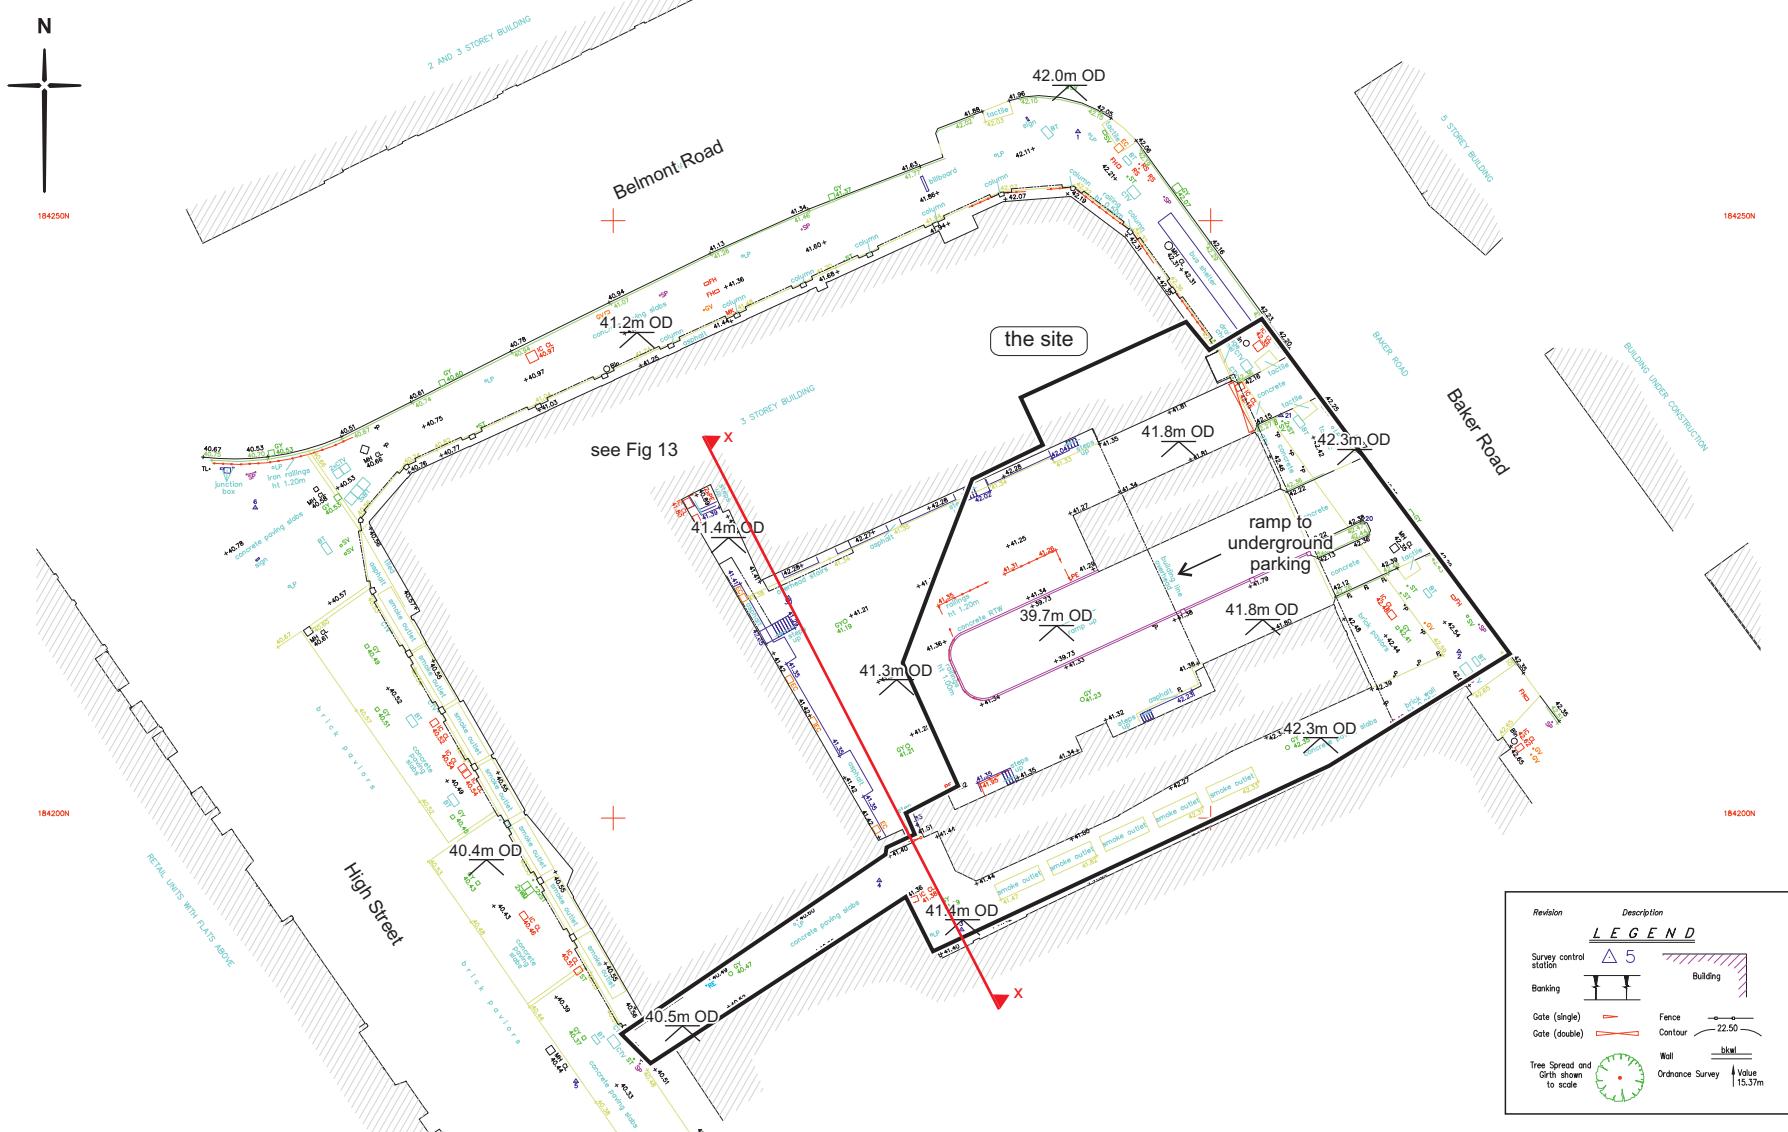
Topographical plan of the existing site (Terrain Surveyors Limited, Drawing No. TS16-340T1, September 2016)
